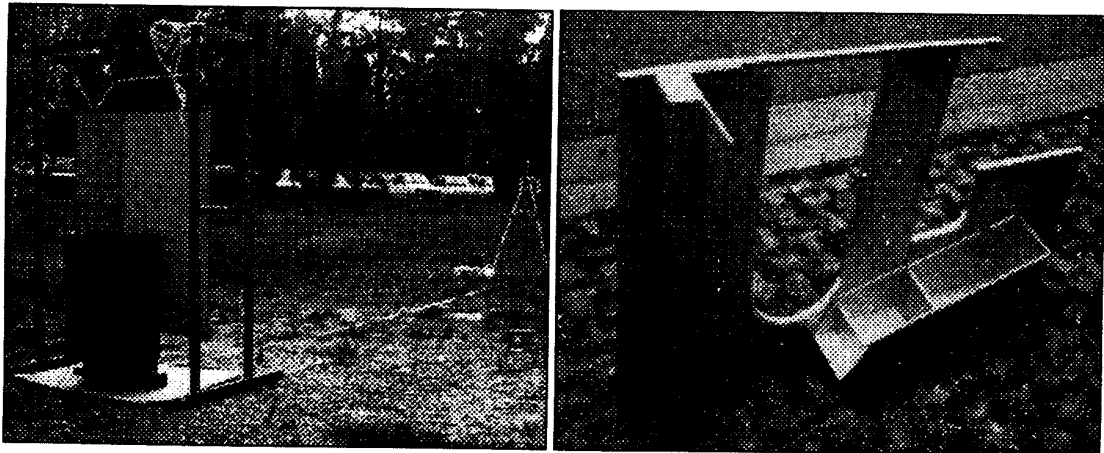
Measuring location view (left). Absorbing panel prototype for a single wheel of the F85 bogie (right).
